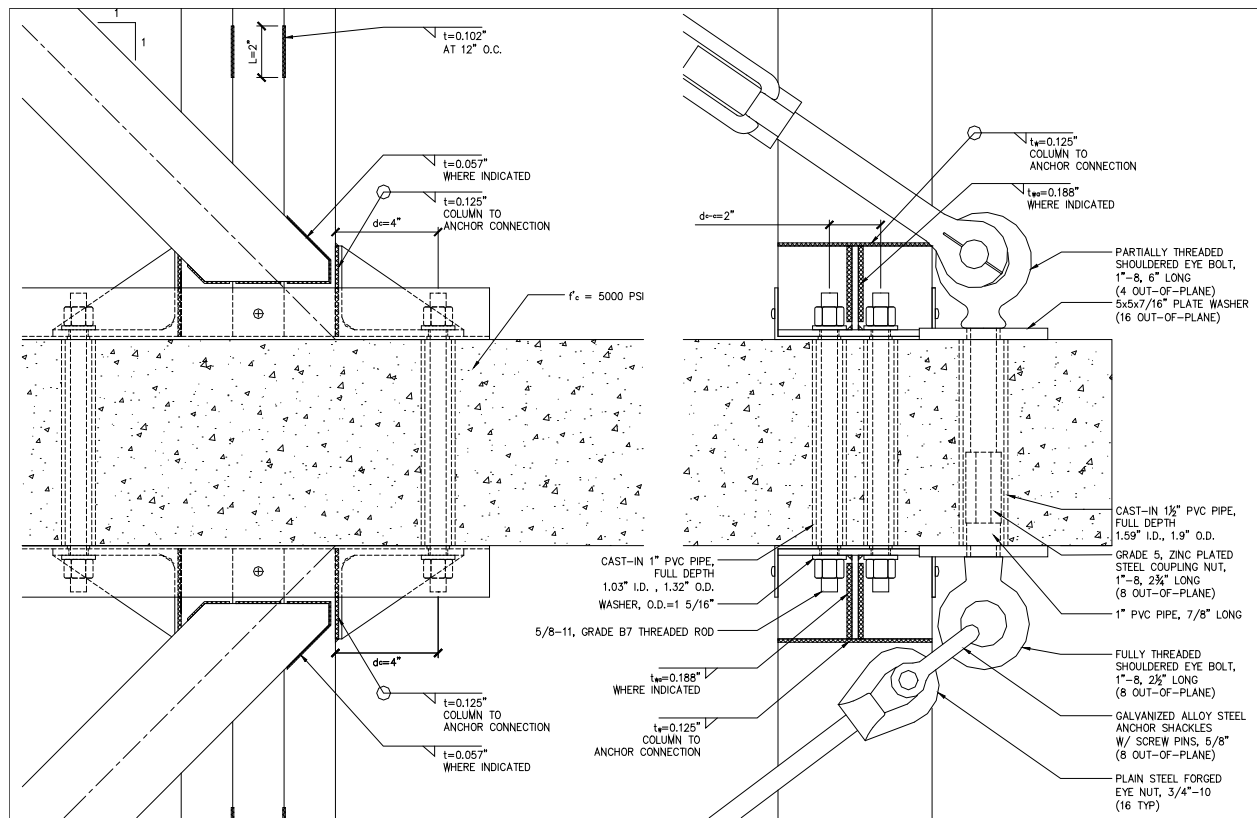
In-plane and out-of-plane connections and anchorage details at the base beam.
